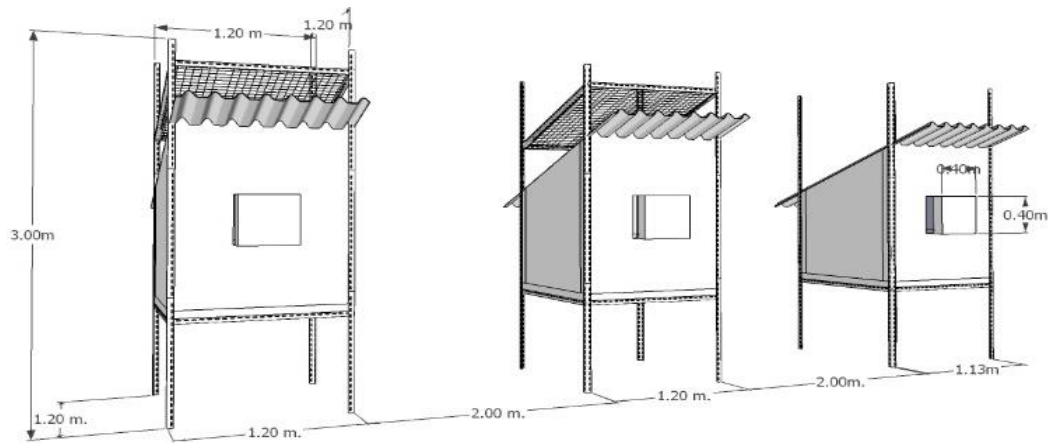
Mockup room 1(a) Green roof with Spanish Moss, Mockup room 2(b) Green roof with Tillandsia Cotton Candy and Mockup room 3(c) Fiber cement roof without green roof.
